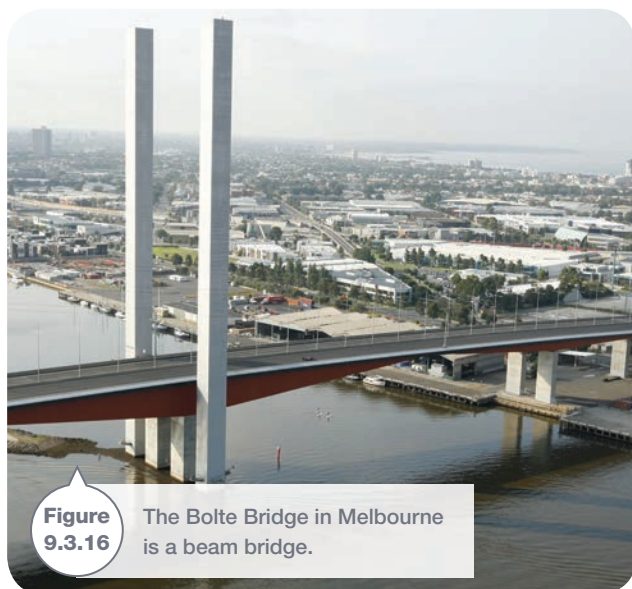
The Bolte Bridge in Melbourne is a beam bridge.
